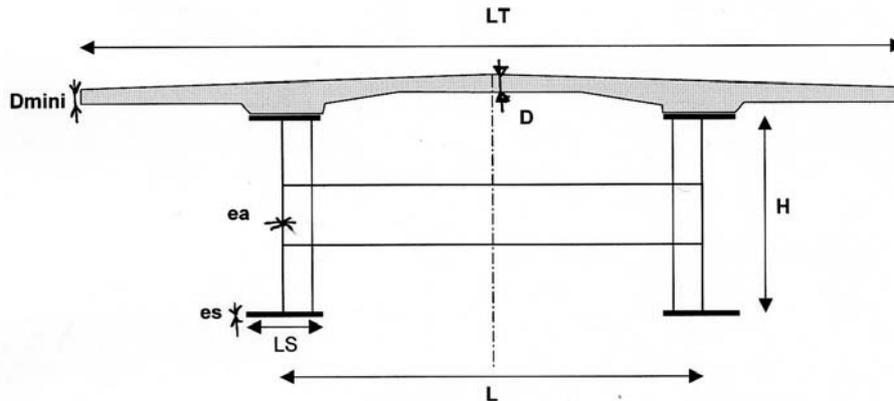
Design parameters for a twin girder cross-beam composite bridge
